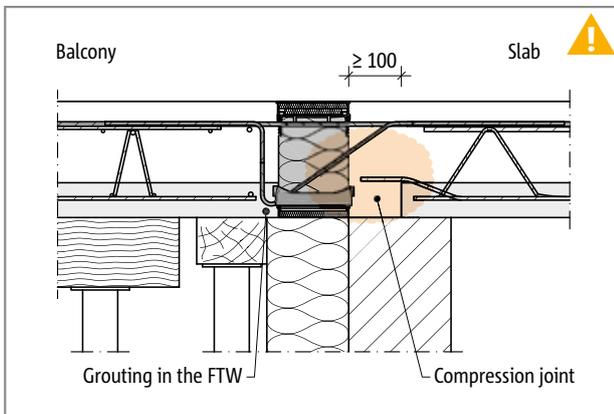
Schöck Isokorb® XT type K: Direct support, installation in conjunction with element slabs (here: $h \leq 180$ mm), compression joint on floor side
